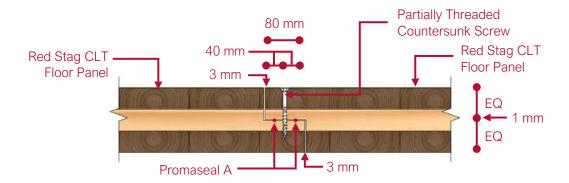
Red Stag three (3) layer CLT floor to floor half-lap joint connection.
